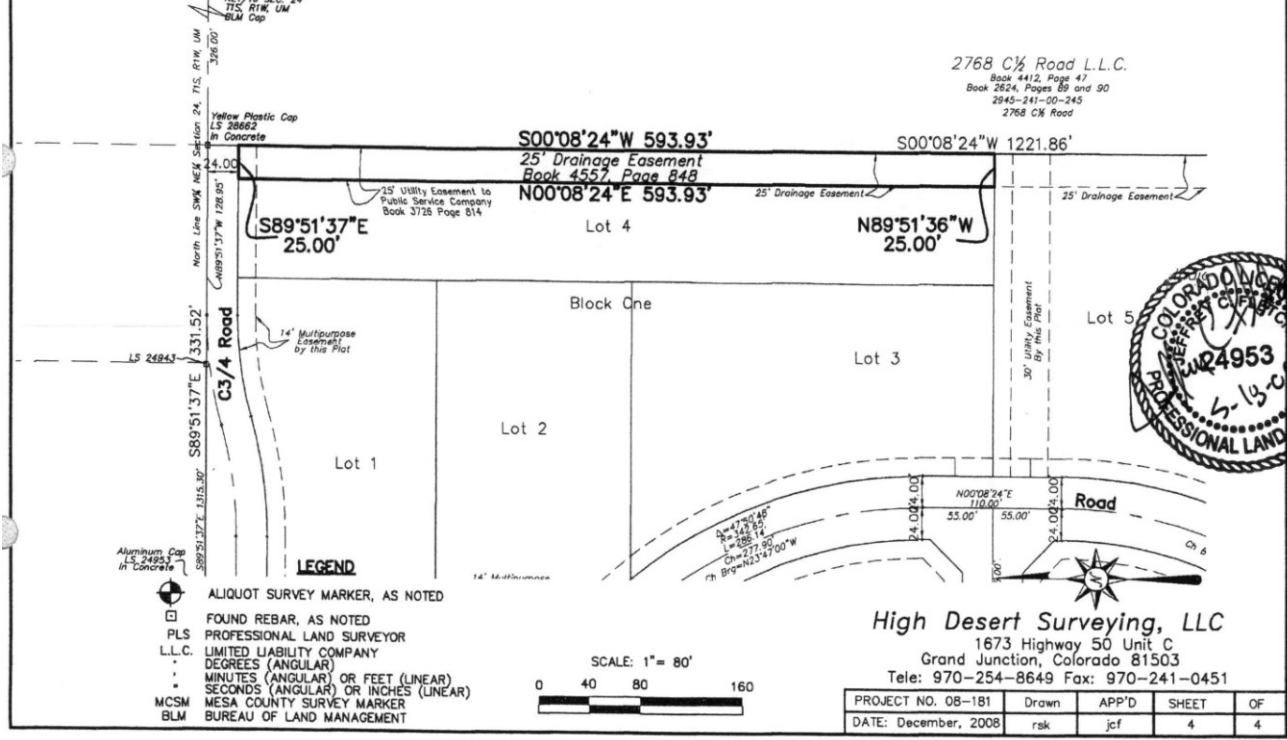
EXHIBIT B - DRAINAGE EASEMENT DEDICATION
